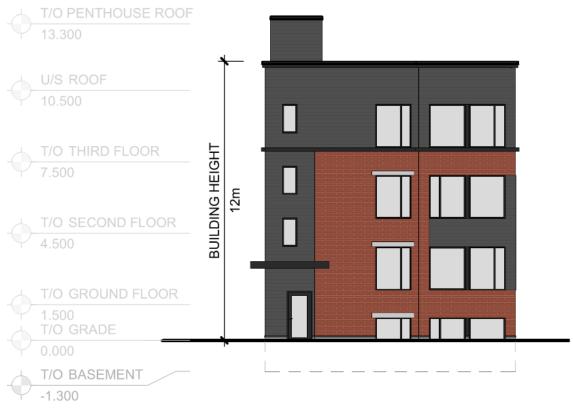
Building Elevation (Wood Street Facade) - Revised May 2, 2025
